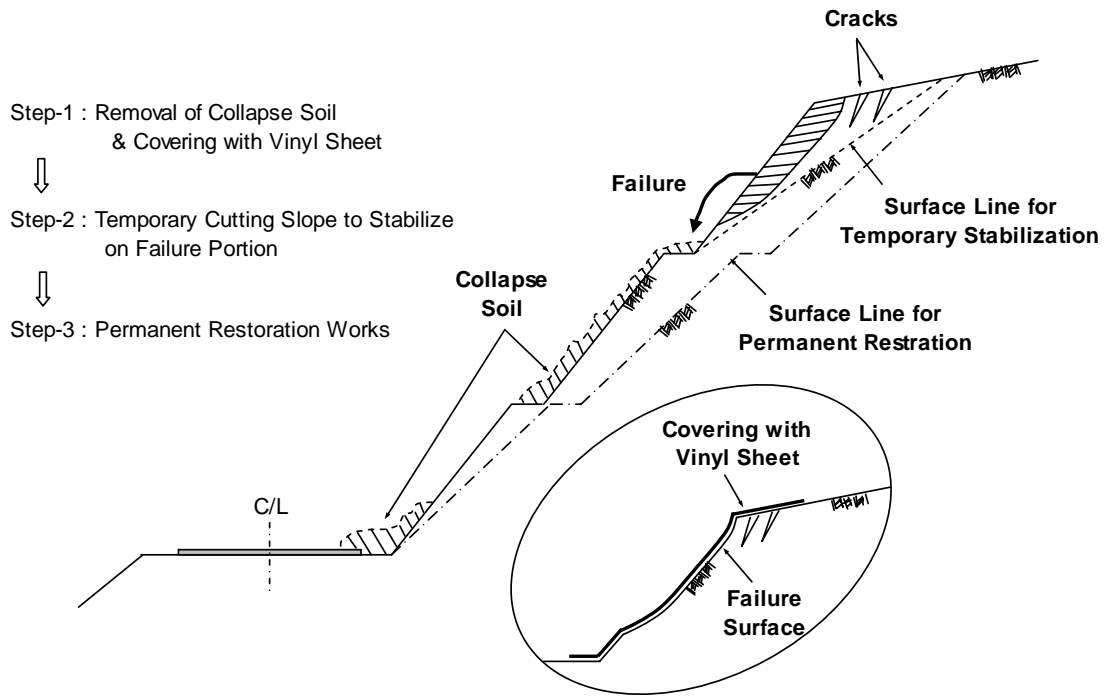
Example of Emergency Measures and Restoration after Cracks and Failure on the Upper Slope
